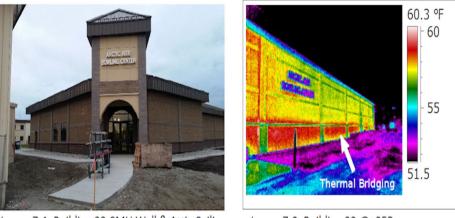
Building 23 CMU Wall & Attic Ceiling
